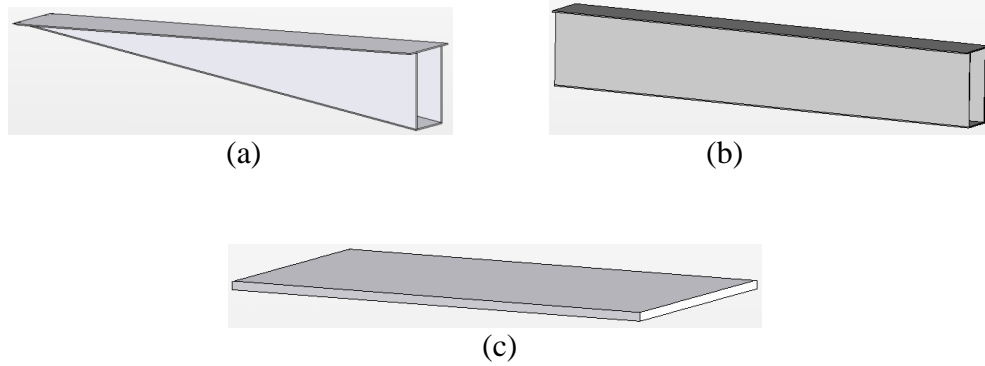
Illustration of the basic building blocks to construct the proposed composite modular bridging; (a) ramp beams, (b) interior beams, (c) deck sections.
